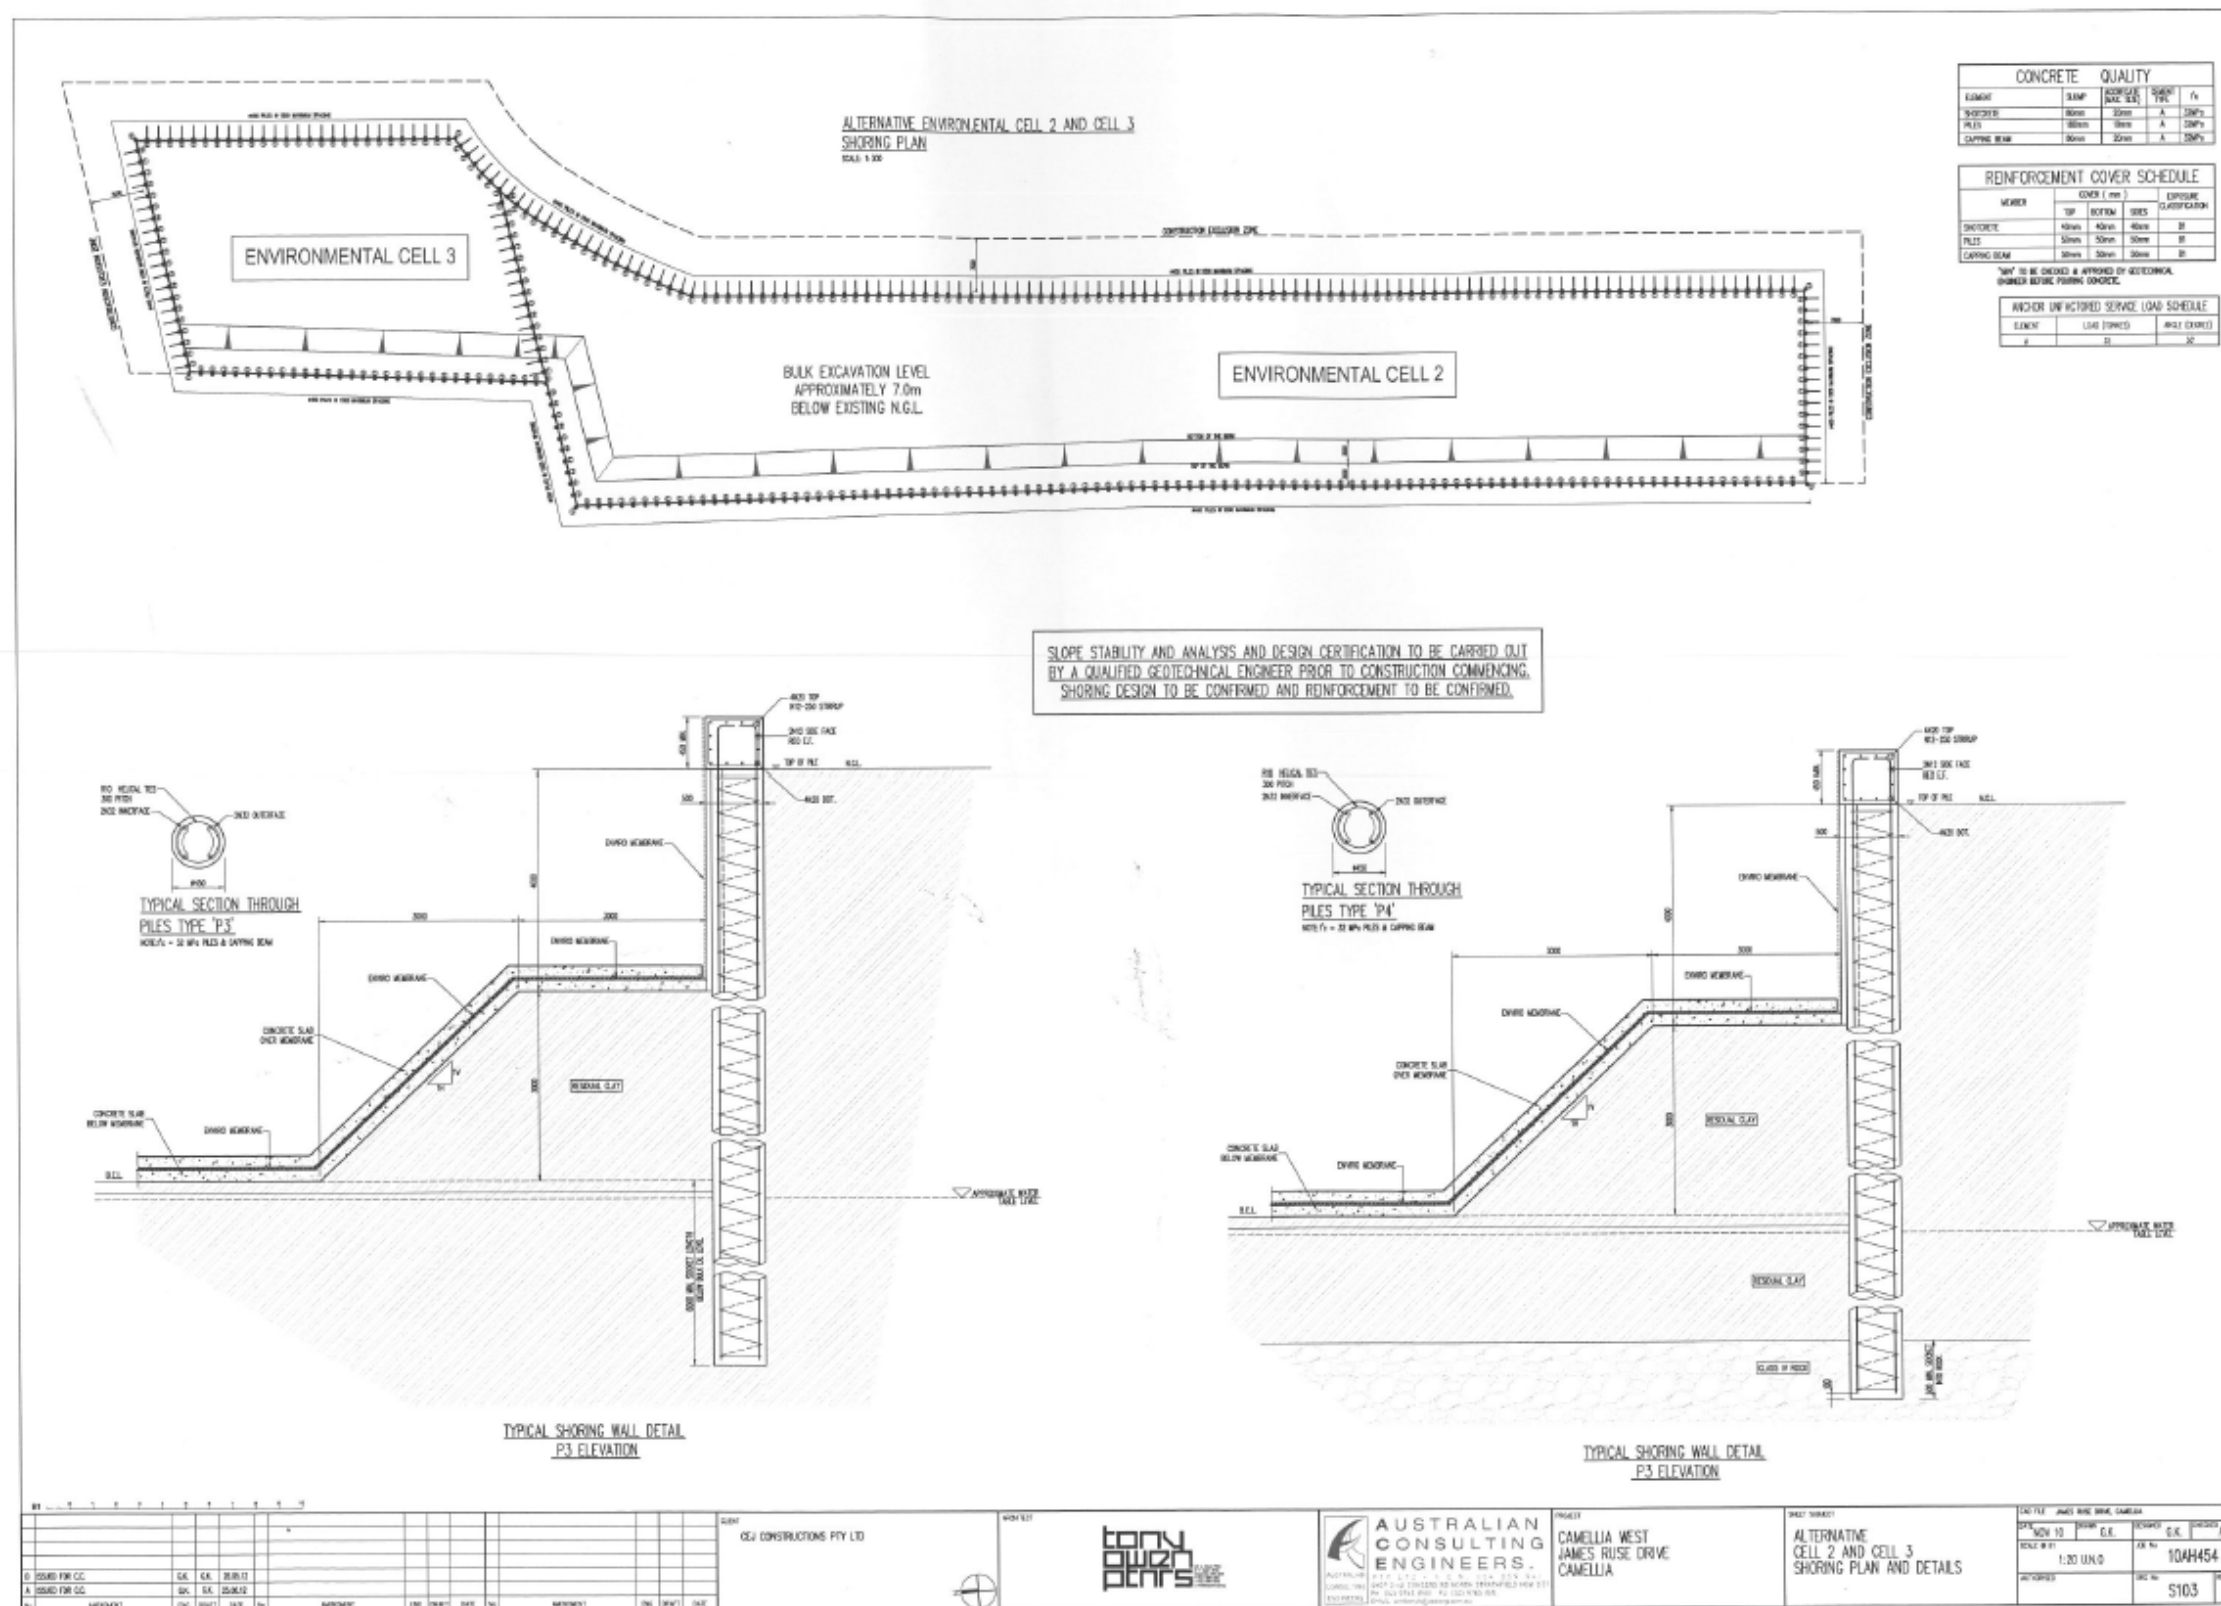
Alternative Cell 2 and Cell 3 Shoring Plan and Details
